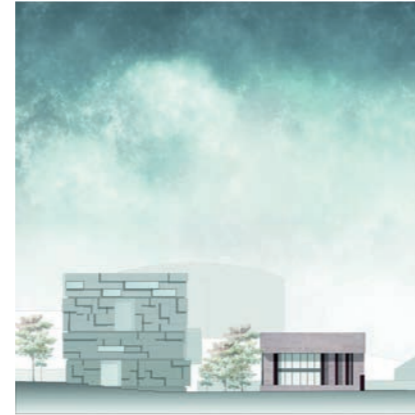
Kunsthalle extension building drawings of South East elevation by Schakel
